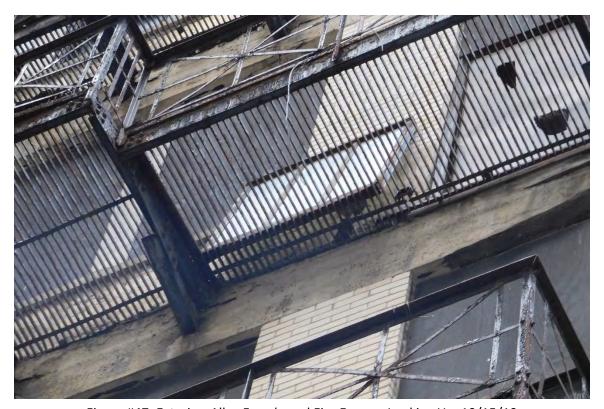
Exterior, Alley Façade and Fire Escape, Looking Up. 10/15/19
